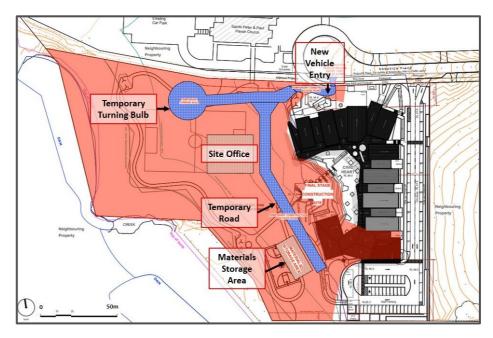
| Stage 6 site construction configuration and layout (Source: Applicant's EIS 2018)
